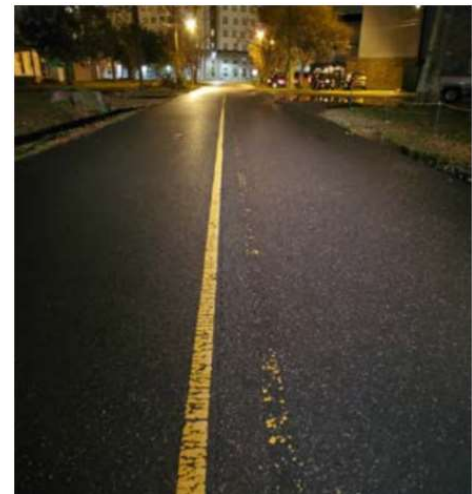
Under Restriped Pavement Marking in Louisiana (2019)
